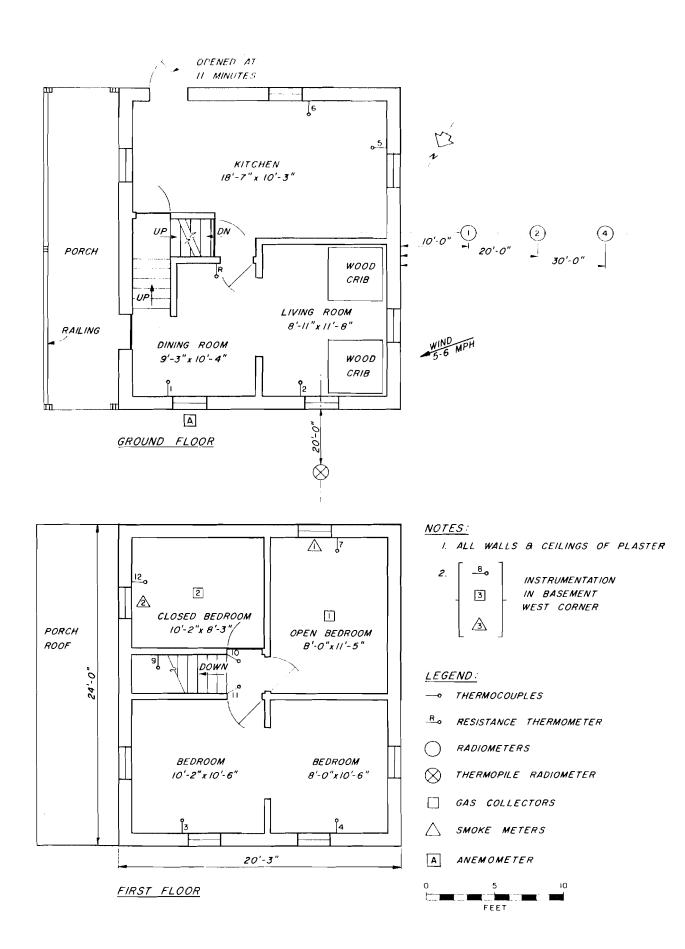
BUILDING No. 1 - TWO-STOREY SOLID BRICK DWELLING
